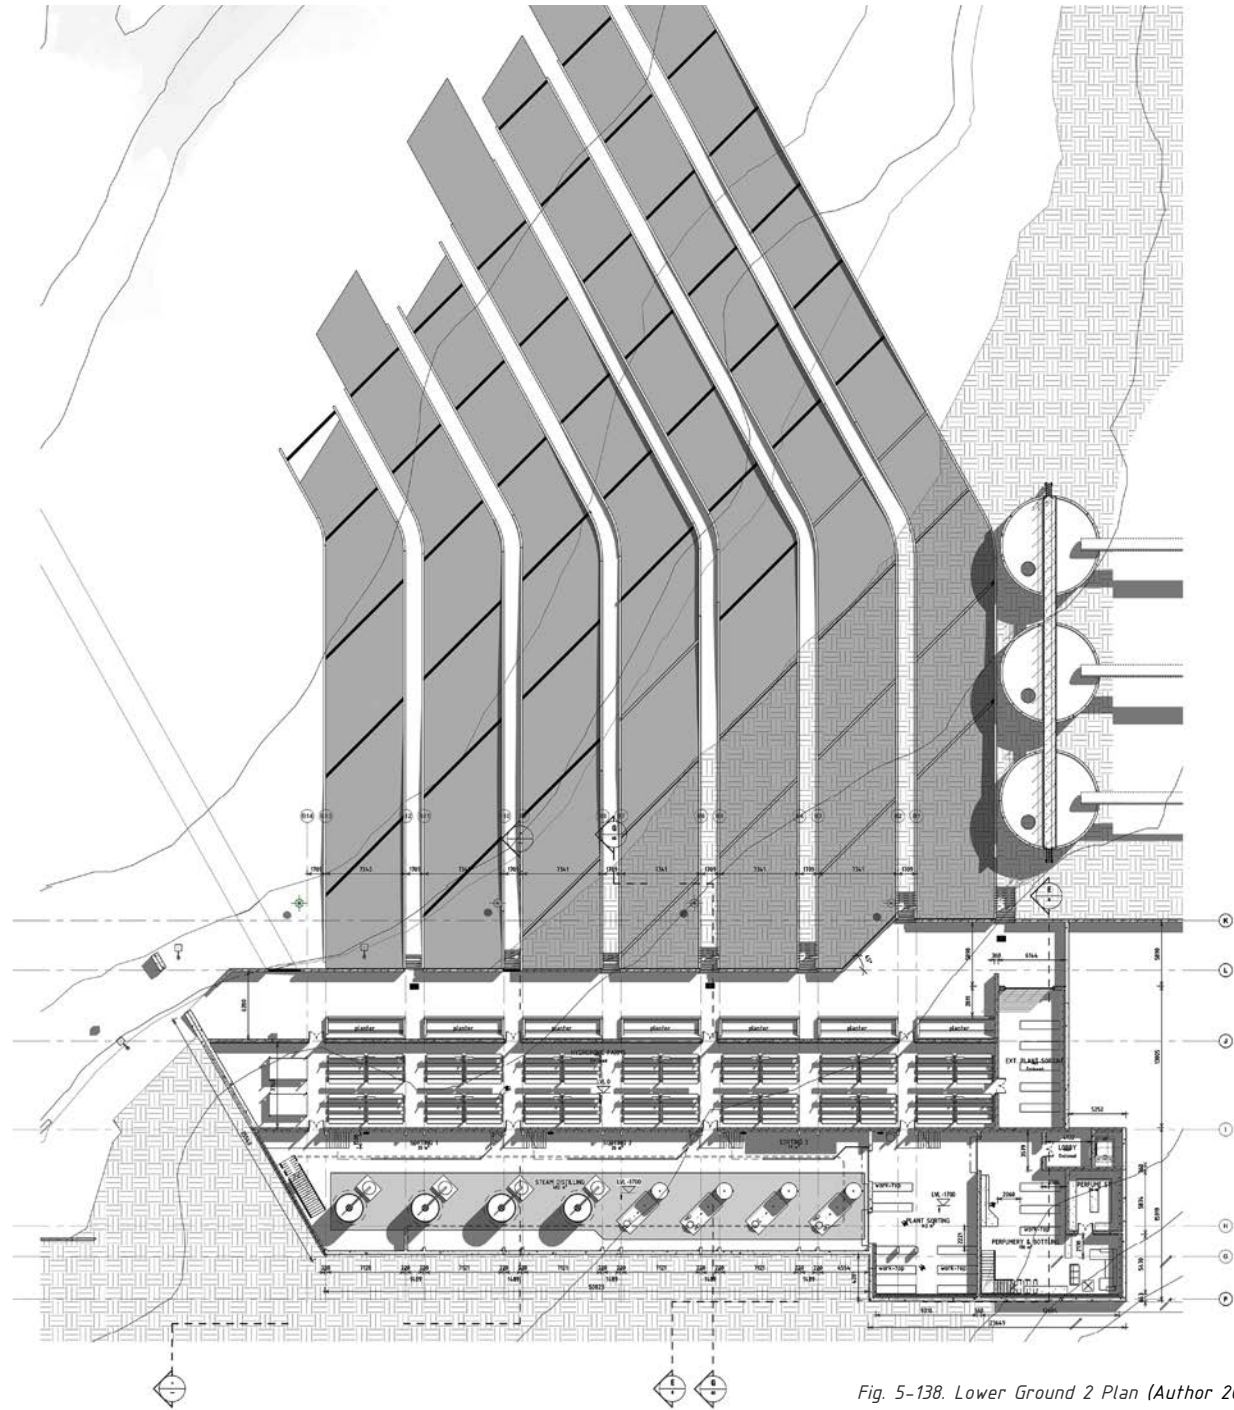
Lower Ground 2 Plan (Author 2018)
